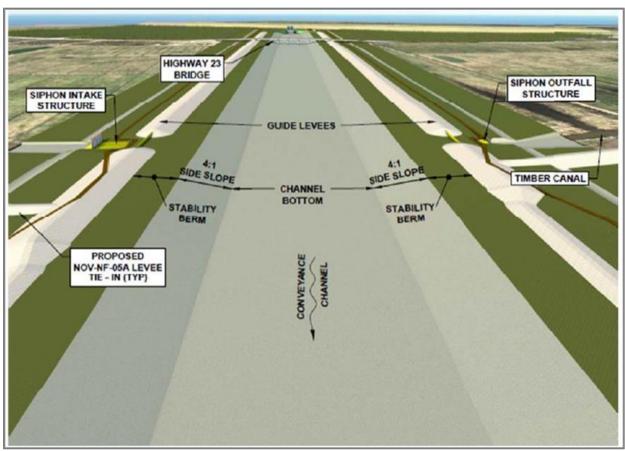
Proposed Conveyance Channel, Guide Levees, Stability Berms, and Siphon
